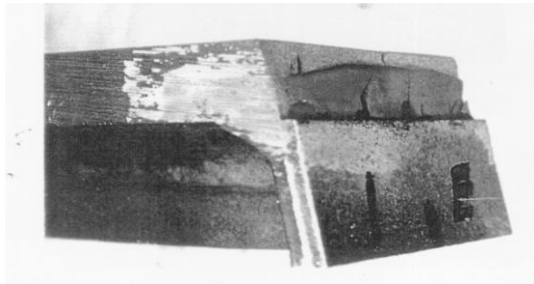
Typical crack at RDDP welded joint (Kolstein, 2007)
